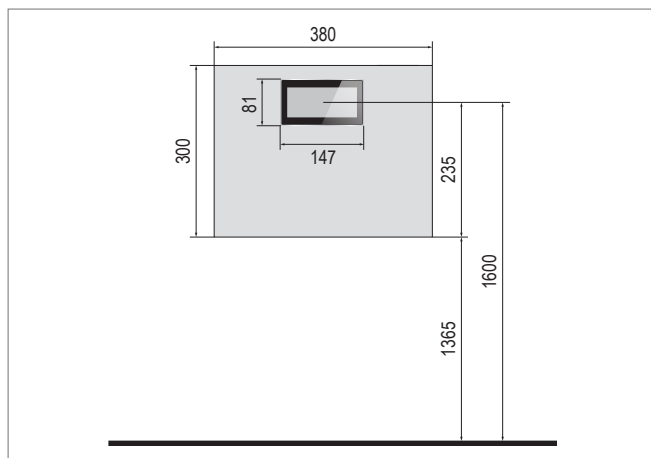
Mounting height for convenient operation (dimensions in mm)
